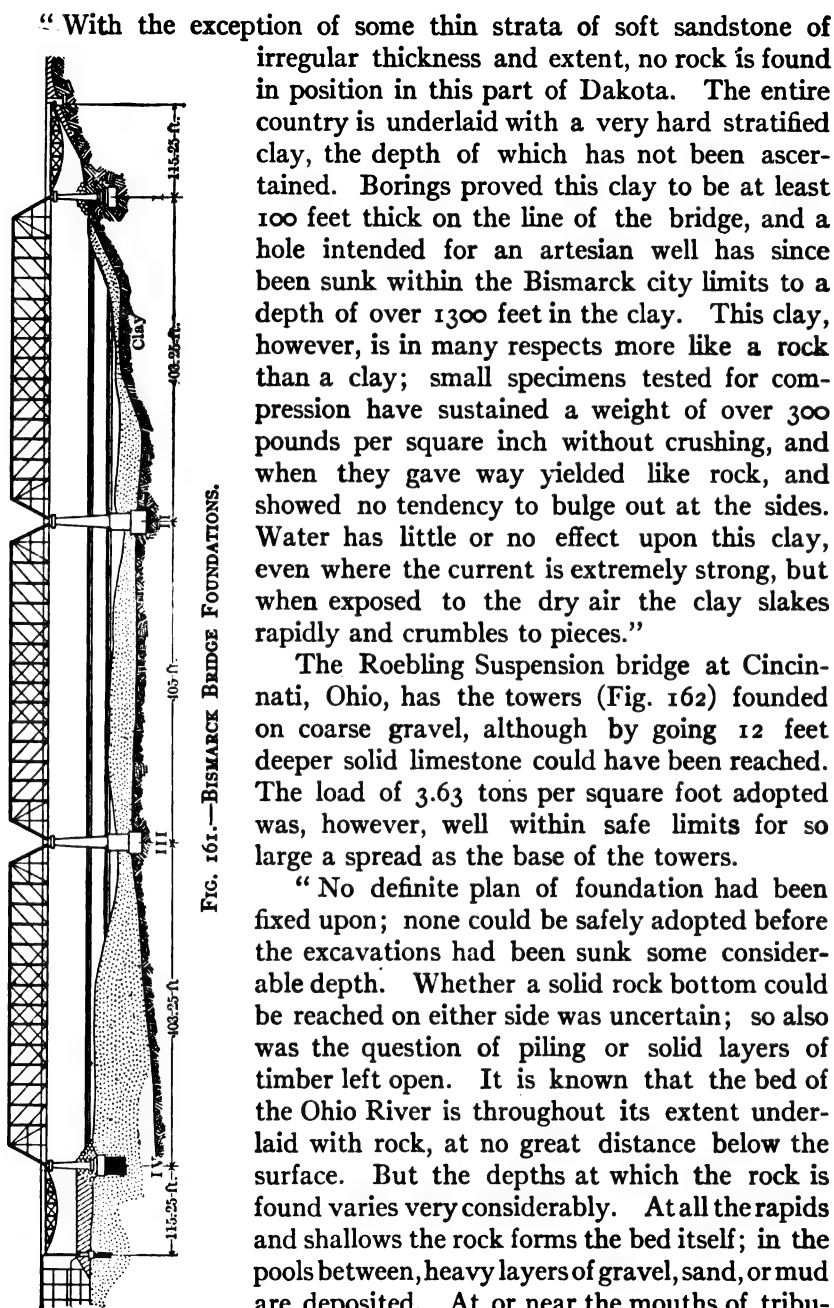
BISMARCK BRIDGE FOUNDATIONS.
